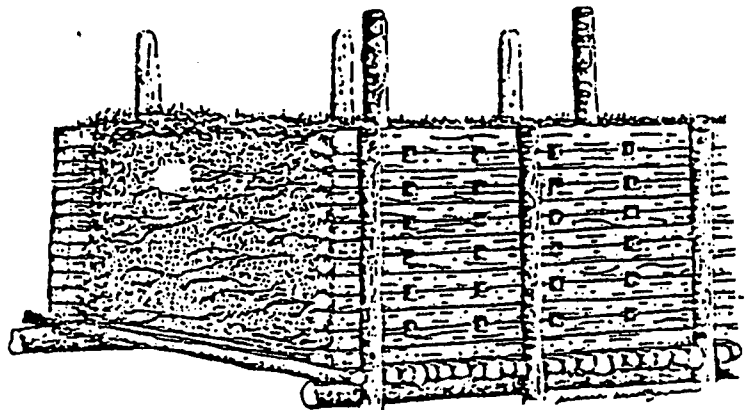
Plans of Various Types of Wharf Construction (from Reed et al. 1995)
